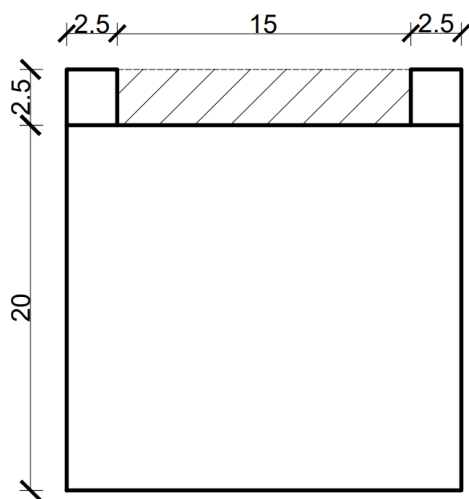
Geometric model size of load reduction culvert (unit: cm)
